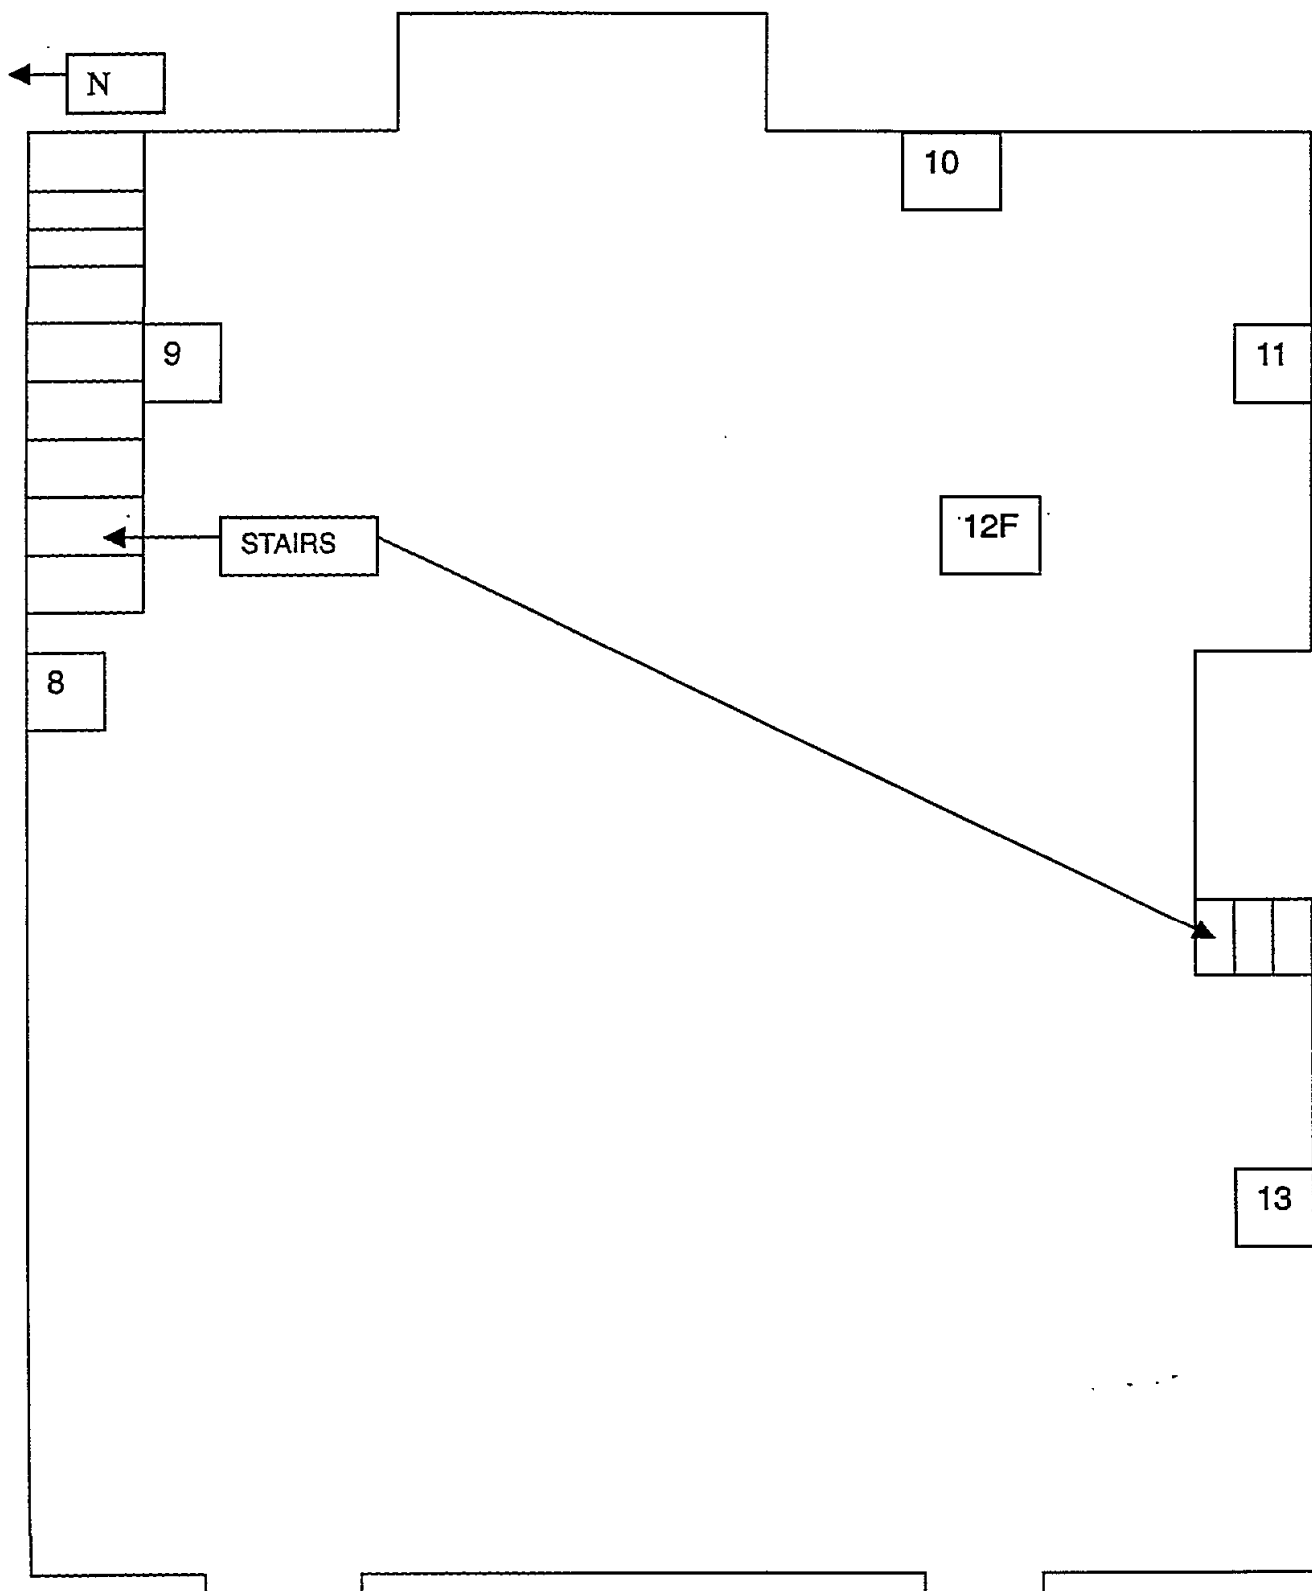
FORMER NORTHWEST LAB SURVEY LOCATIONS
